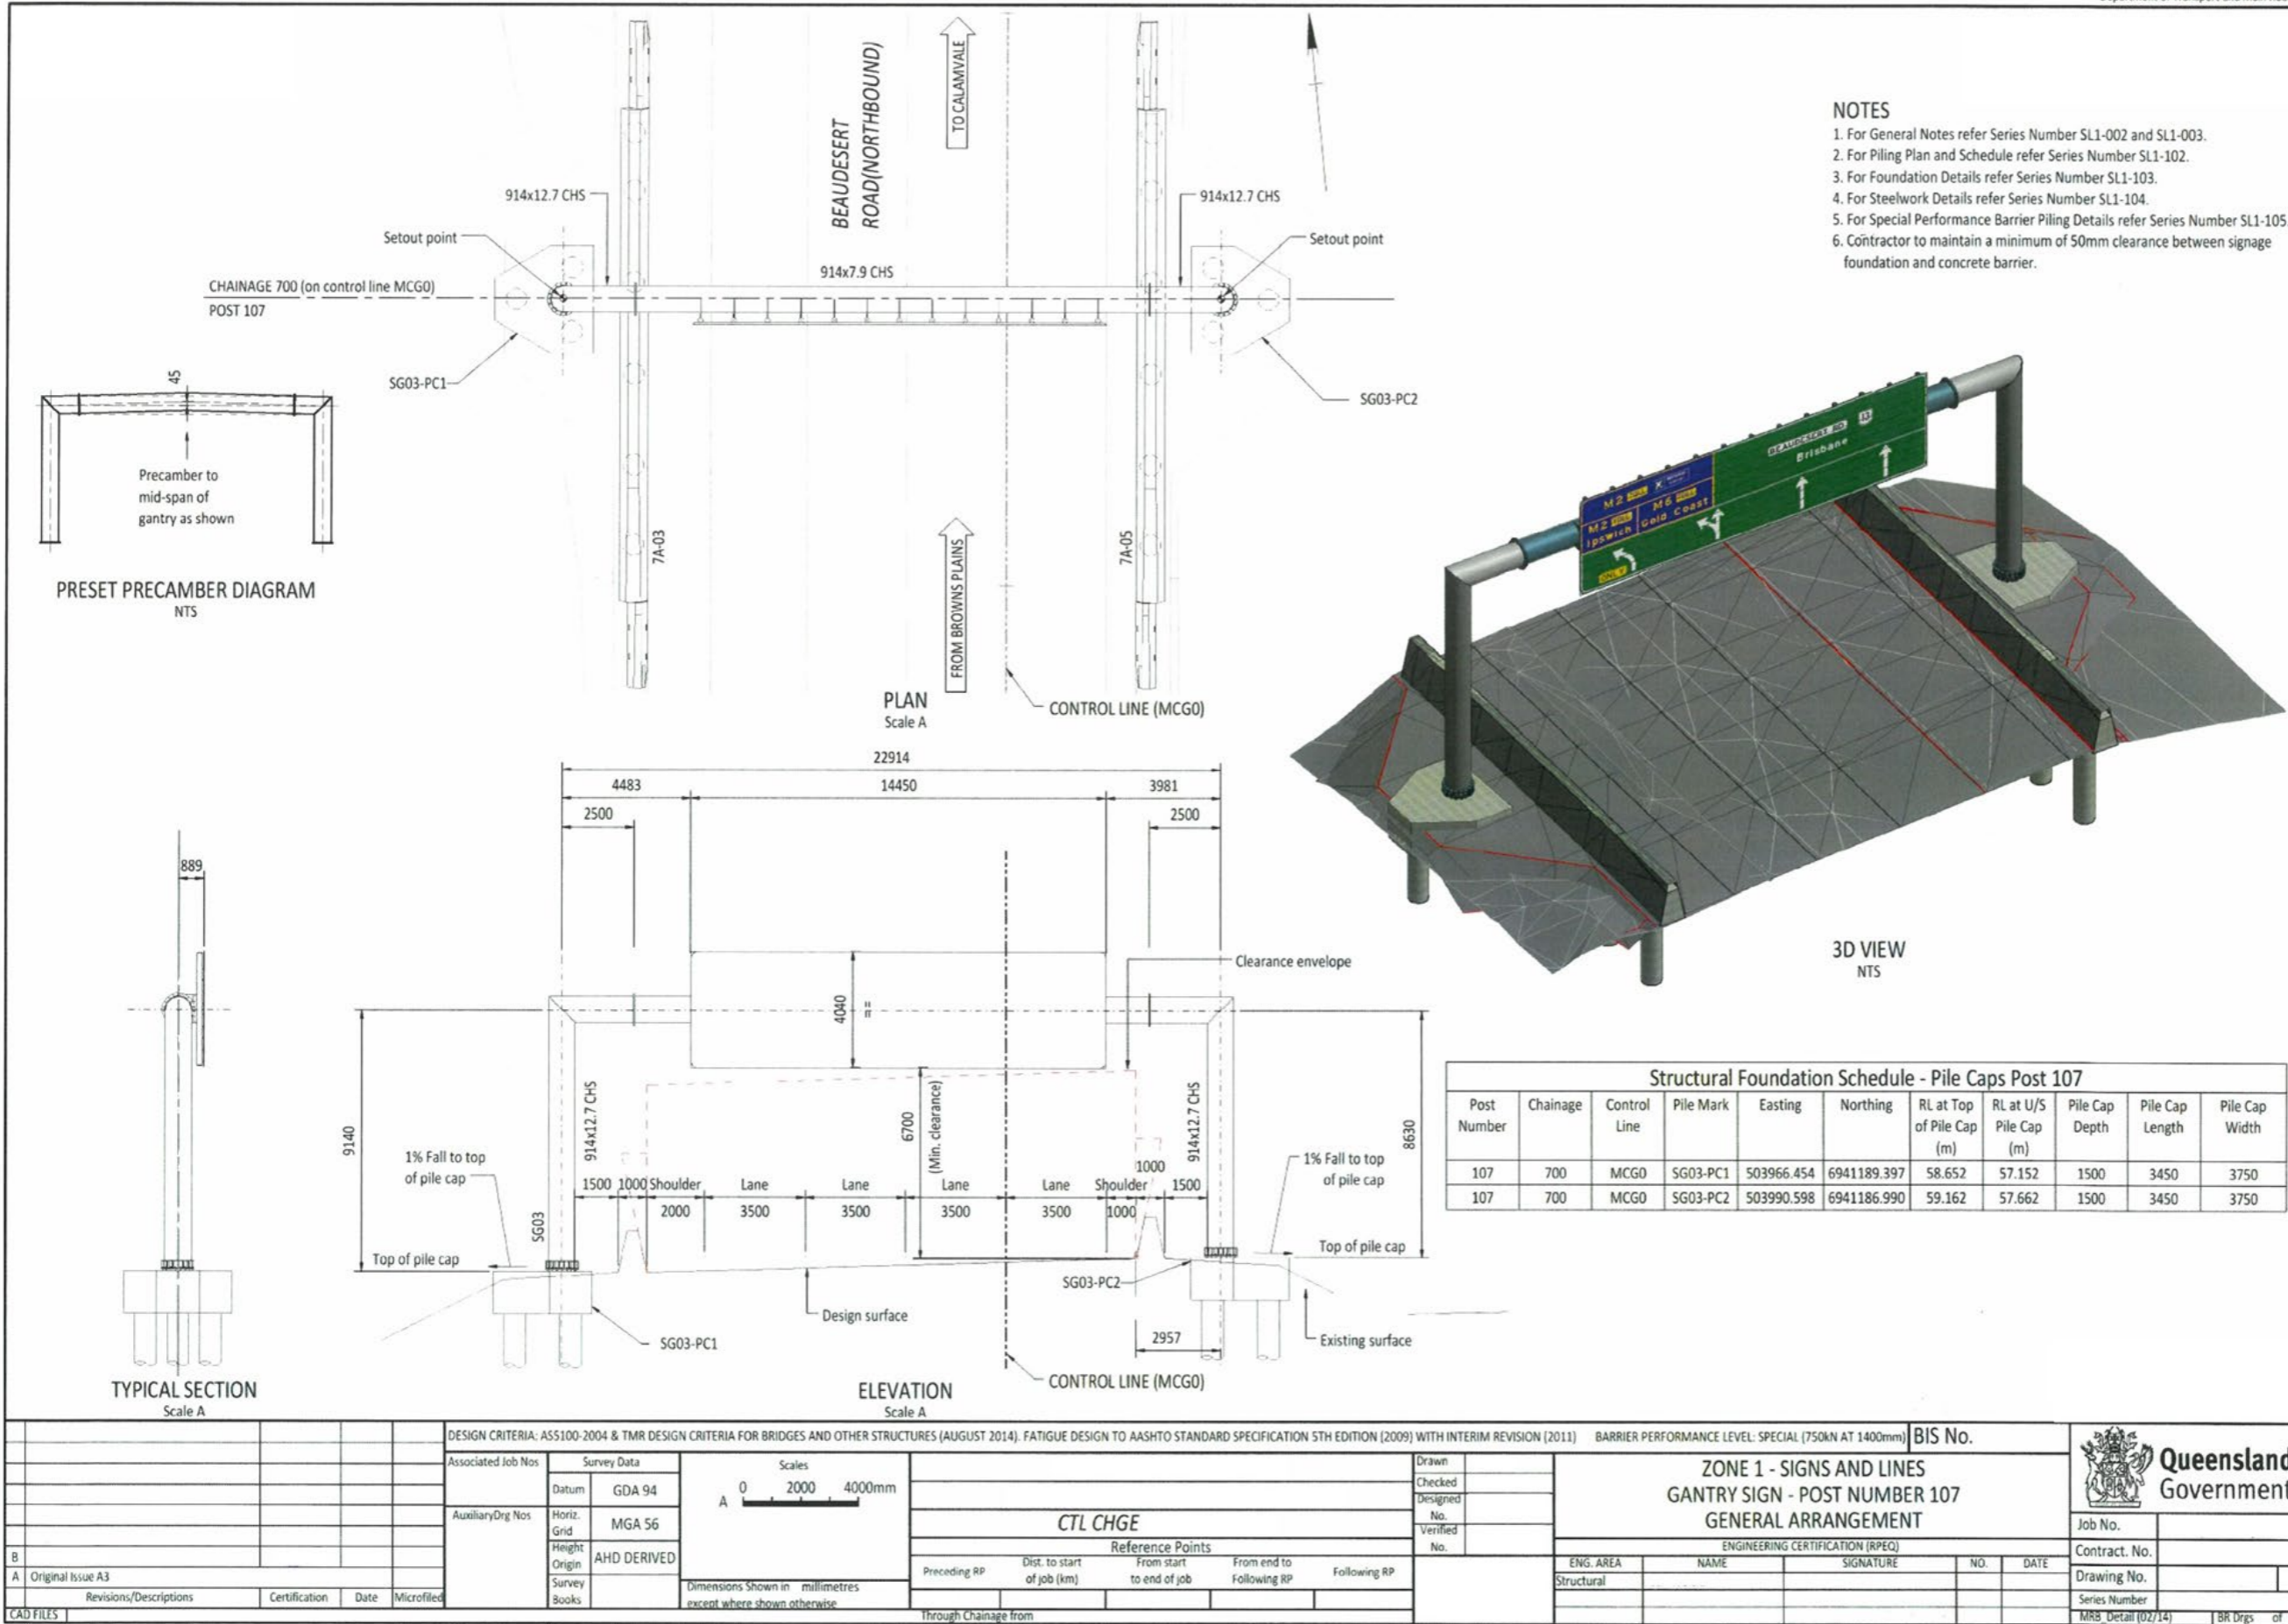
(b) - Circular Hollow Section (CHS) overhead sign - Sheet 2
